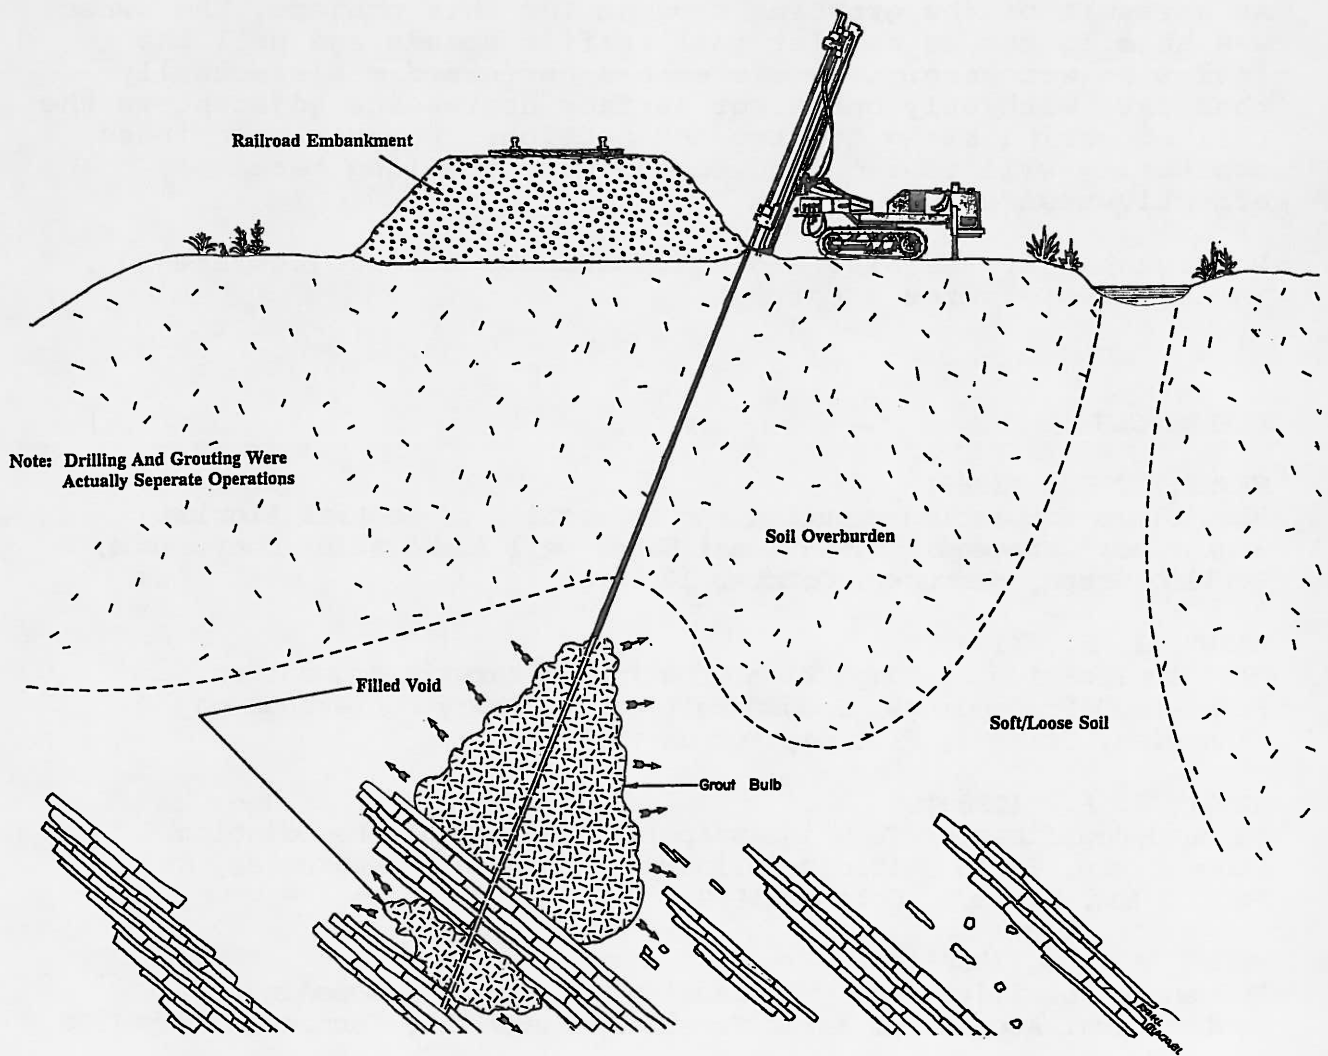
Schematic Cross-Section of Compaction Grouting Remediation System.
